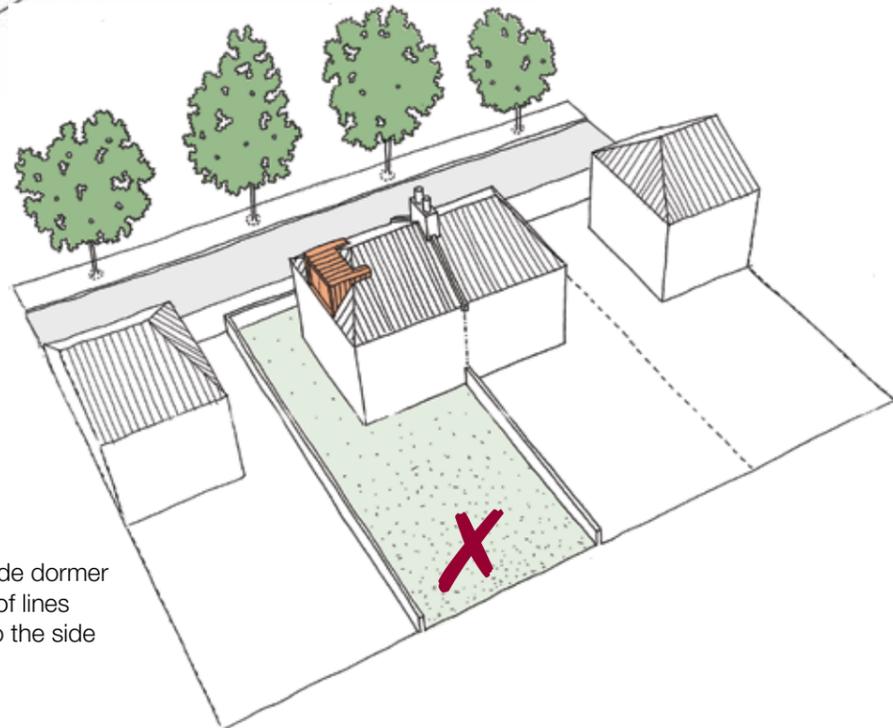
Single side dormer window breaks the roof lines and is inappropriate to the side elevation
